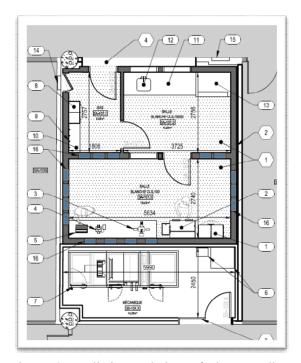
Preliminary design of the Canadian Curation Facility (dimensions and layout are subject to change).
